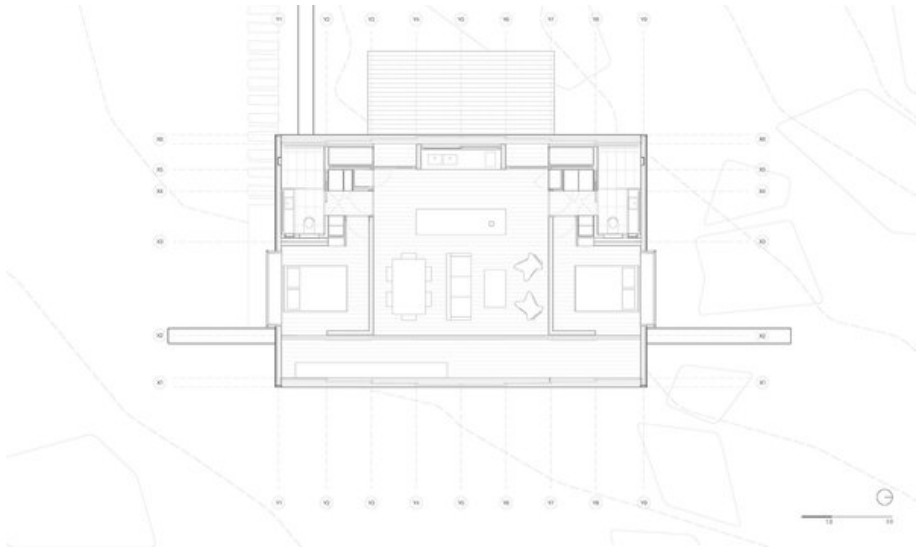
Floorplan of retreat [MAPA Architects, n.d.]
